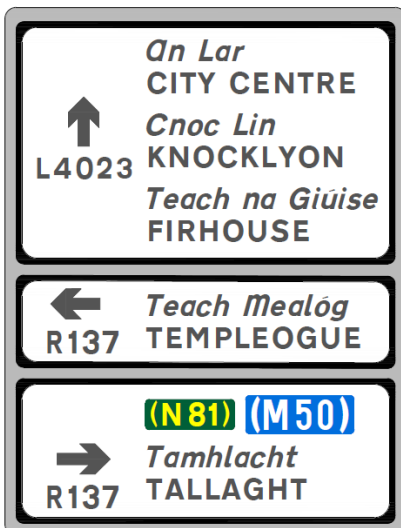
Extract from Traffic Signs and Road Markings Drawings (Sheet 30)
